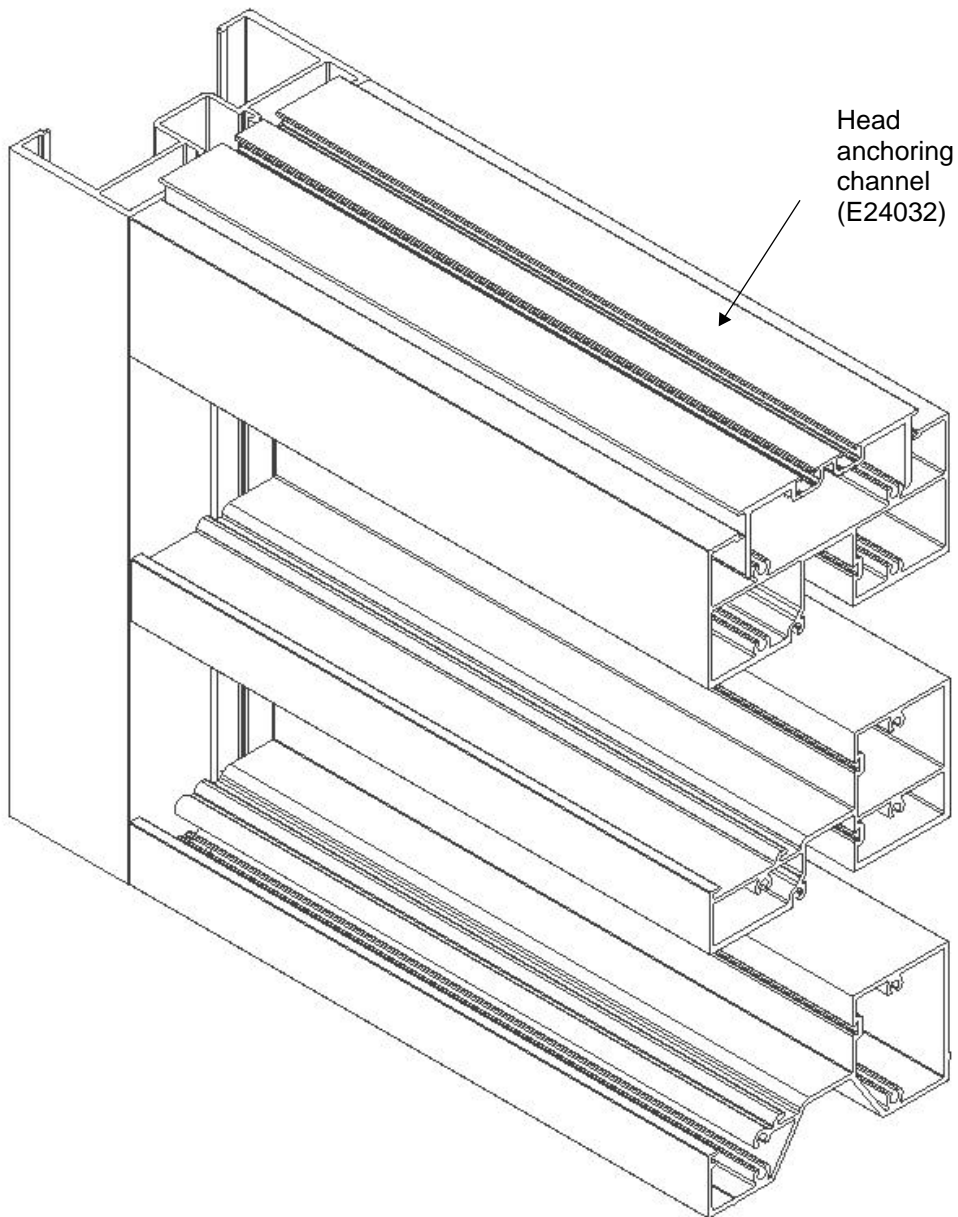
Attach a head anchoring channel (E24032) to the head horizontal, if desired.
